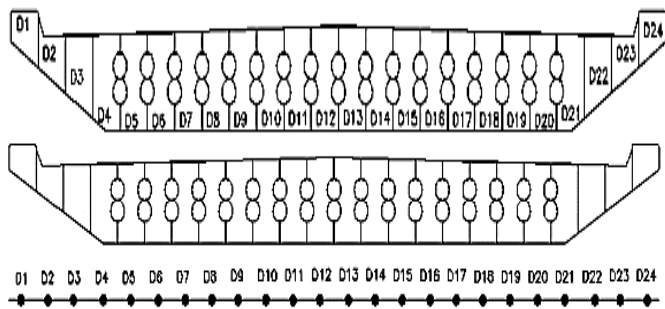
Sections Label for Grillage Modeling at Mid-Span.
